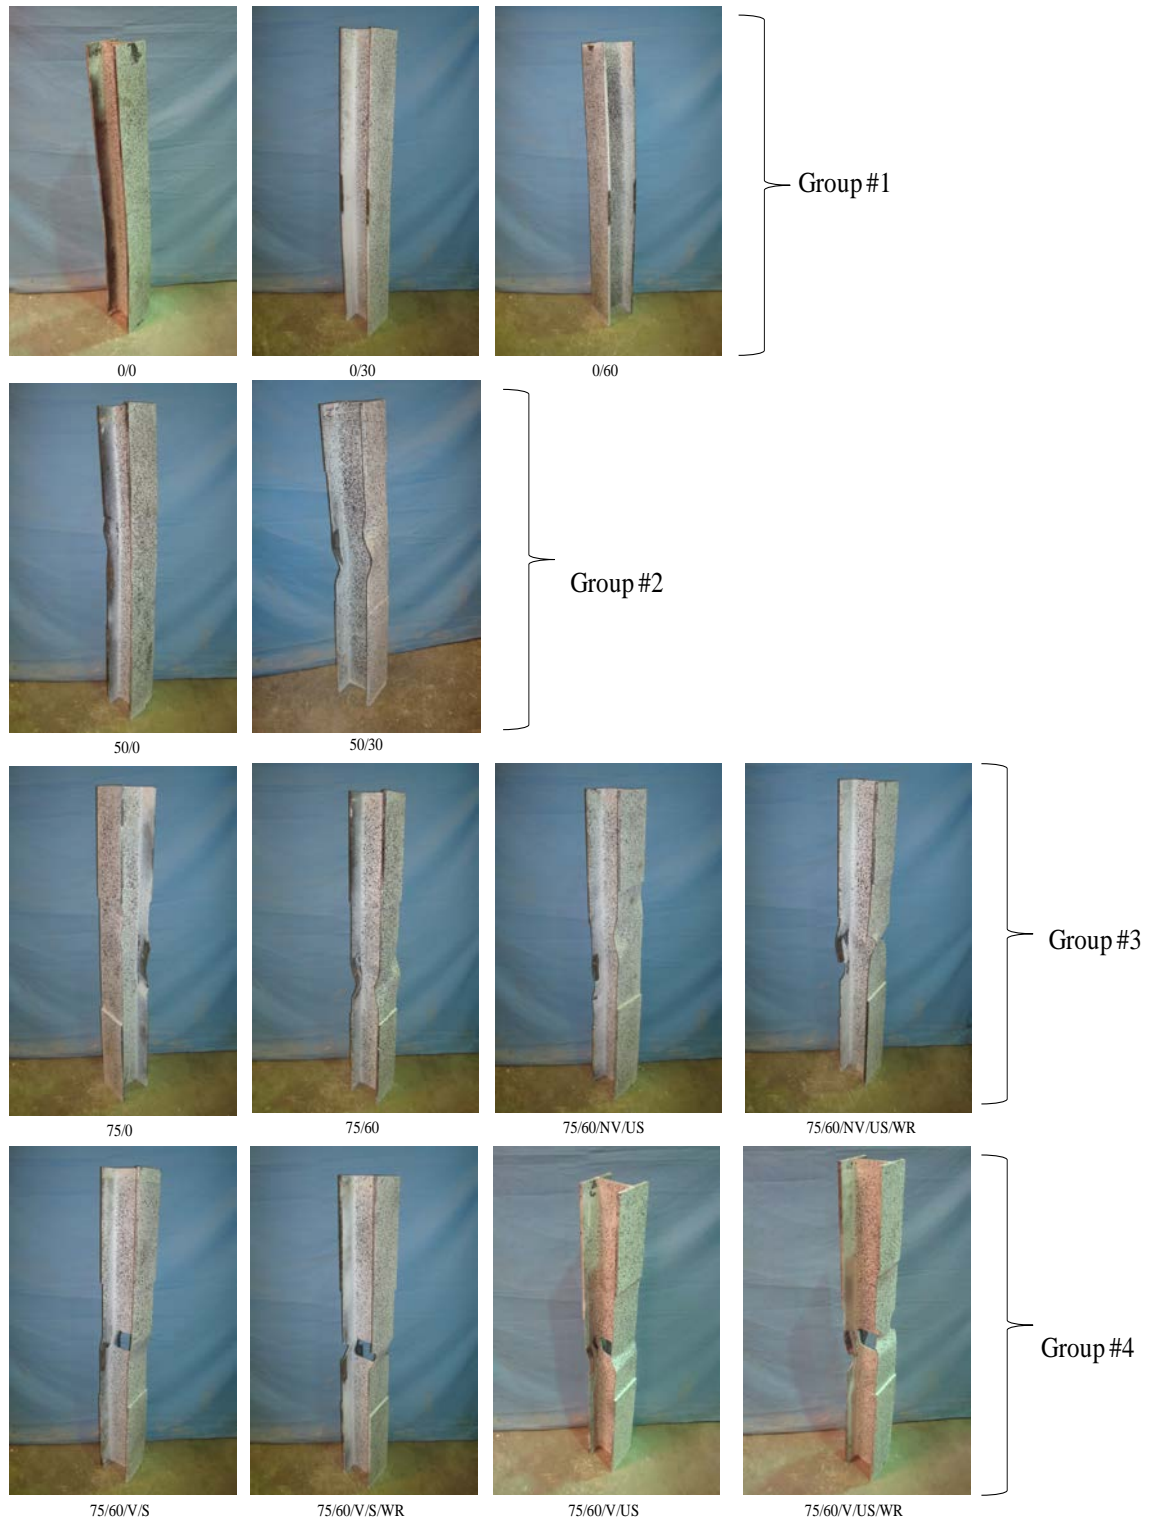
Failure Modes of Steel Piles before Repair (Karagah et al., 2013)
